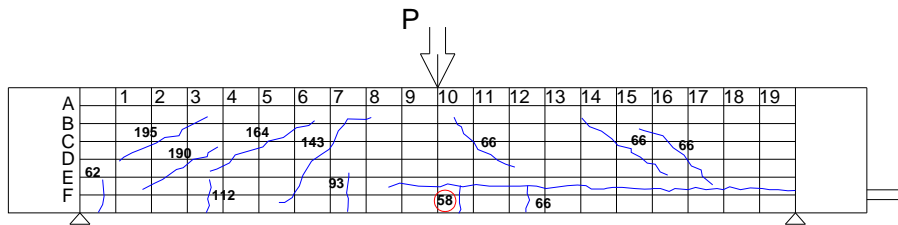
Load-Cracking pattern of specimen A-C2.5-U-3B
